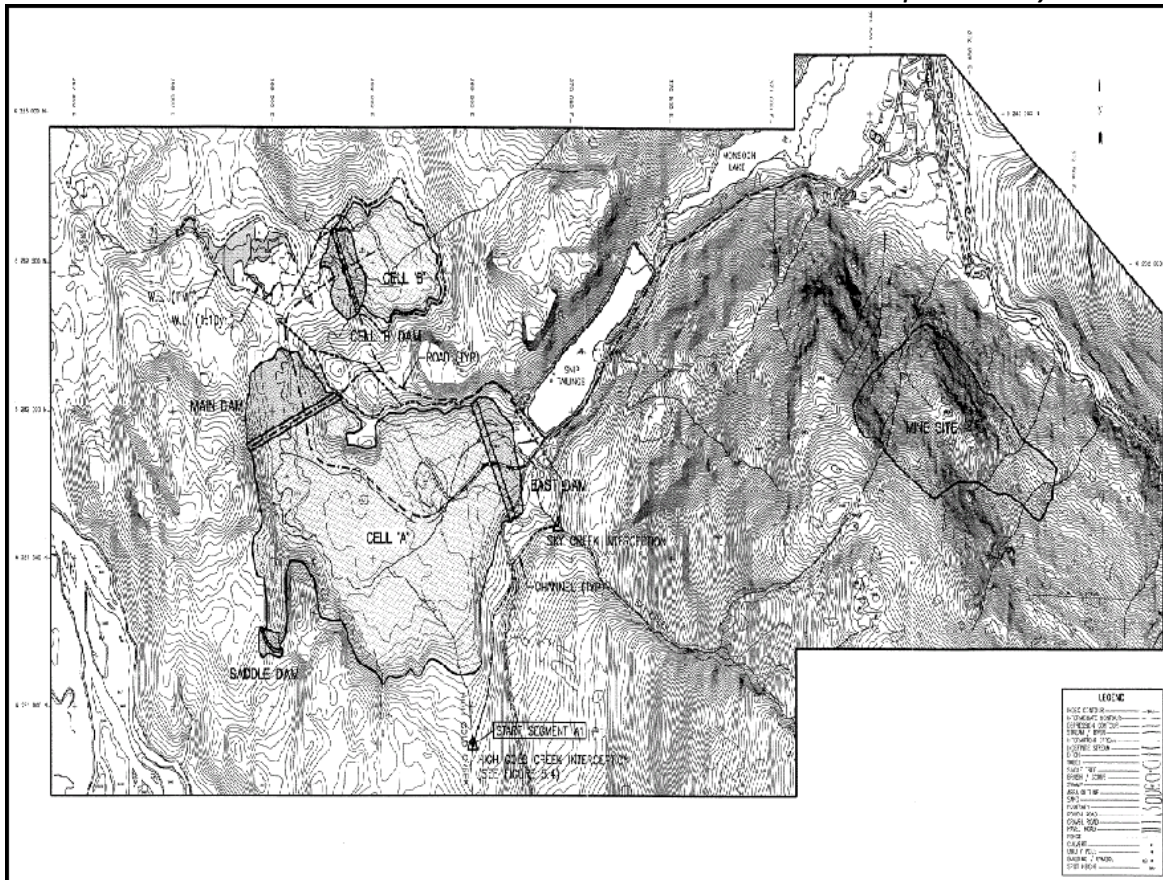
Previous Proposed Tailing Storage Facility Area
